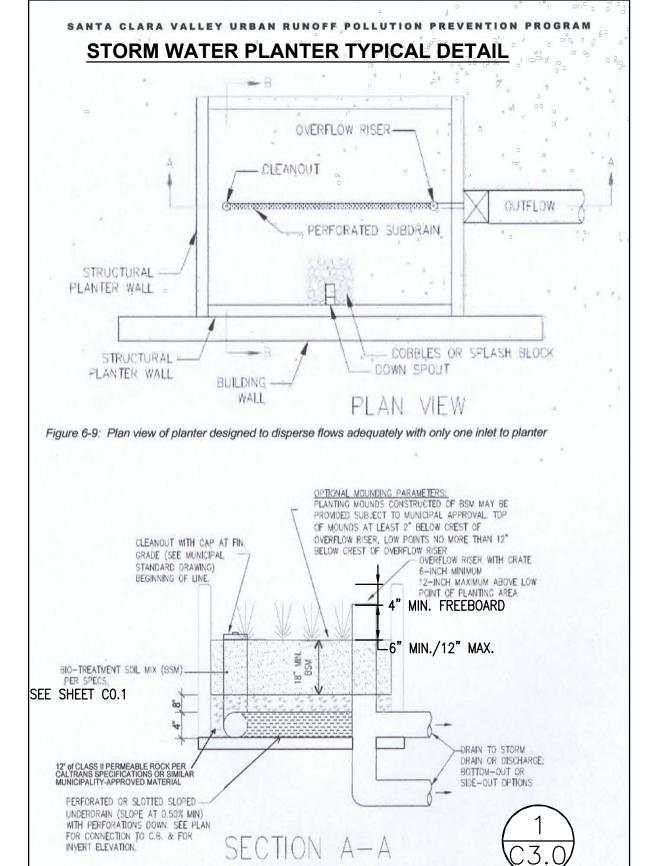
Cross section A-A of flow-through planter, shows side view of underdrain
